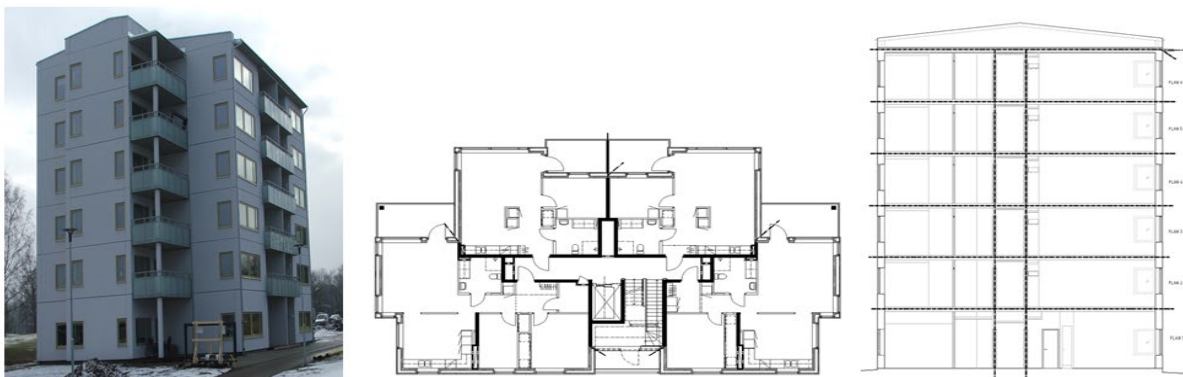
Photograph (left), floor plan (middle) and section (right) of the reference concrete building.
